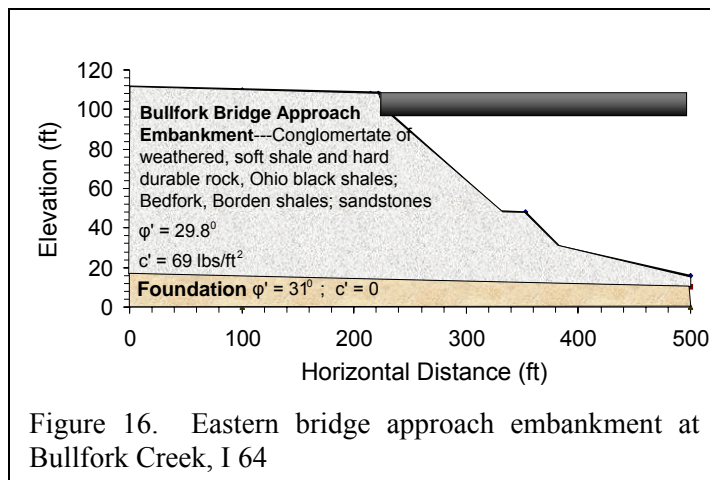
Eastern bridge approach embankment at Bullfork Creek, I 64
